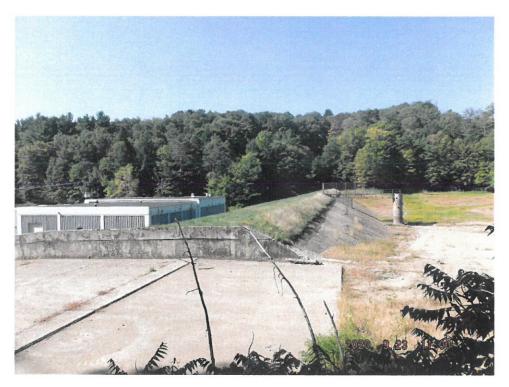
Spillway Entrance and Upstream Embankment looking Southwest
